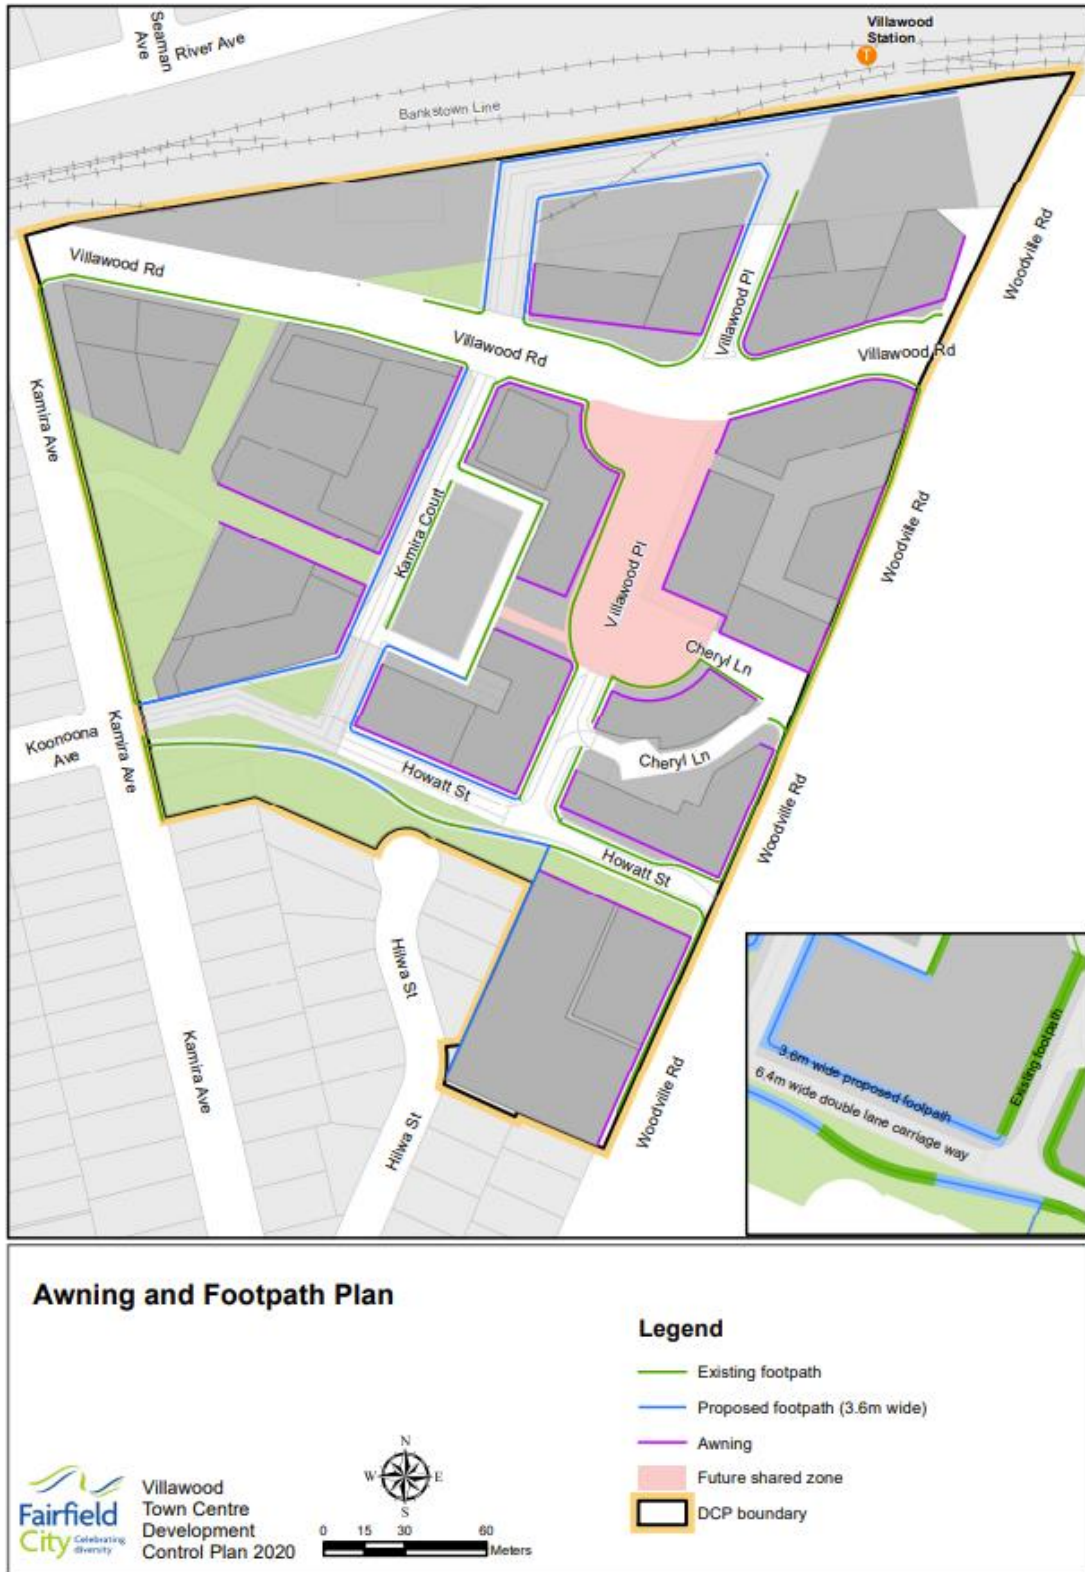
Awning and Footpath Plan – Villawood Town Centre
